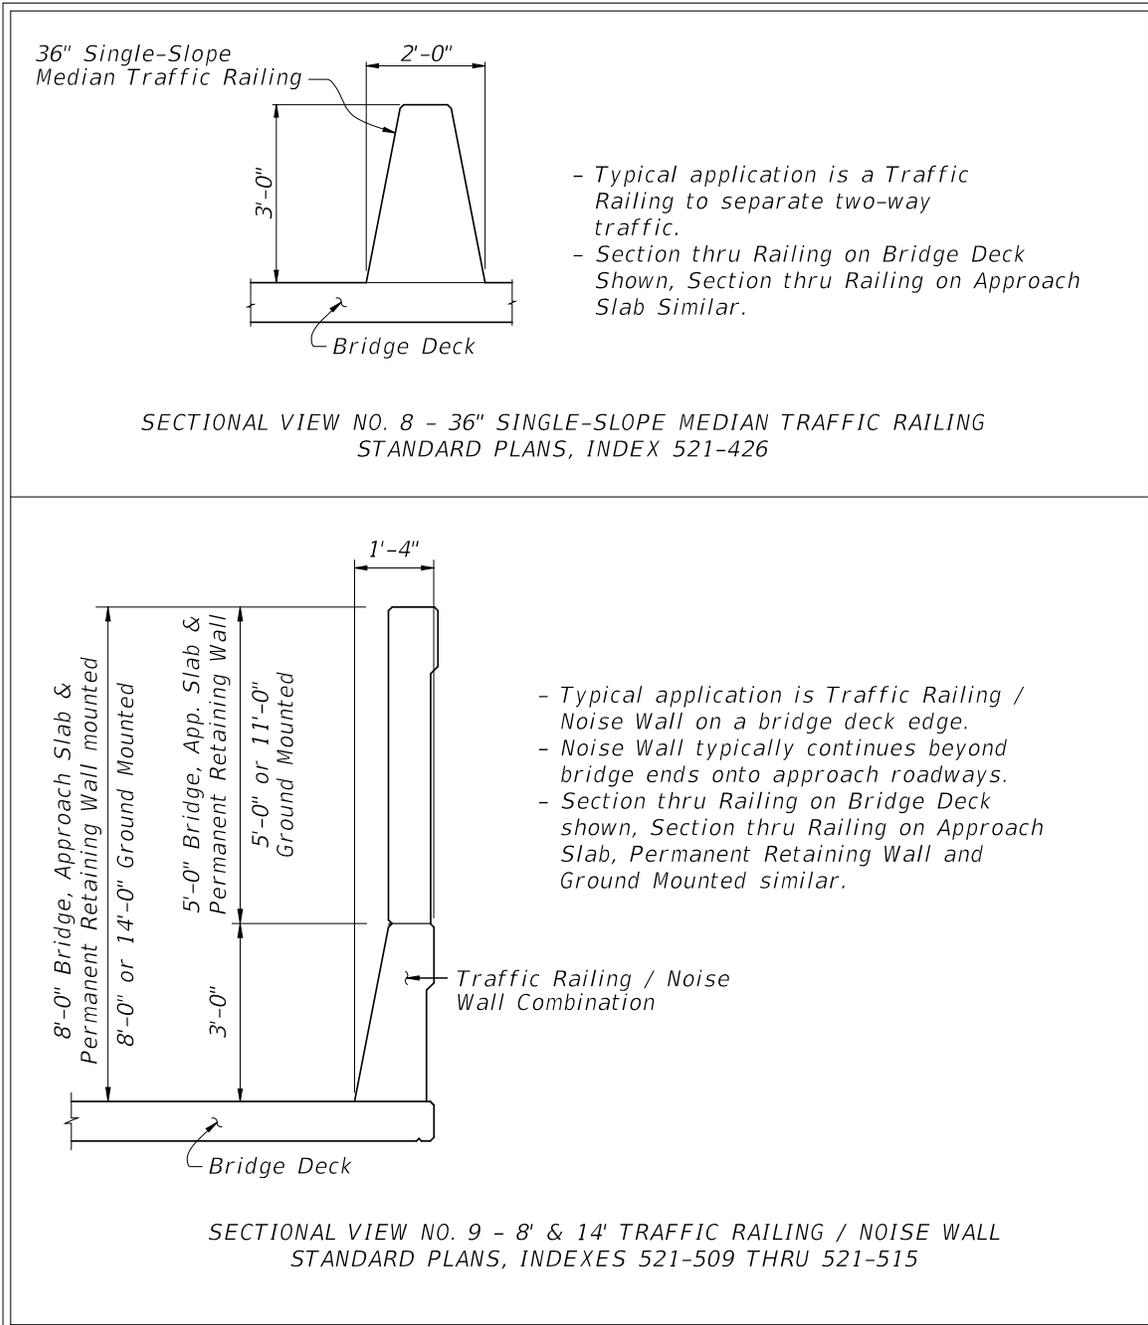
Bridge Traffic Railings – Median Traffic Railing and Traffic Railing/Noise Wall Combination
